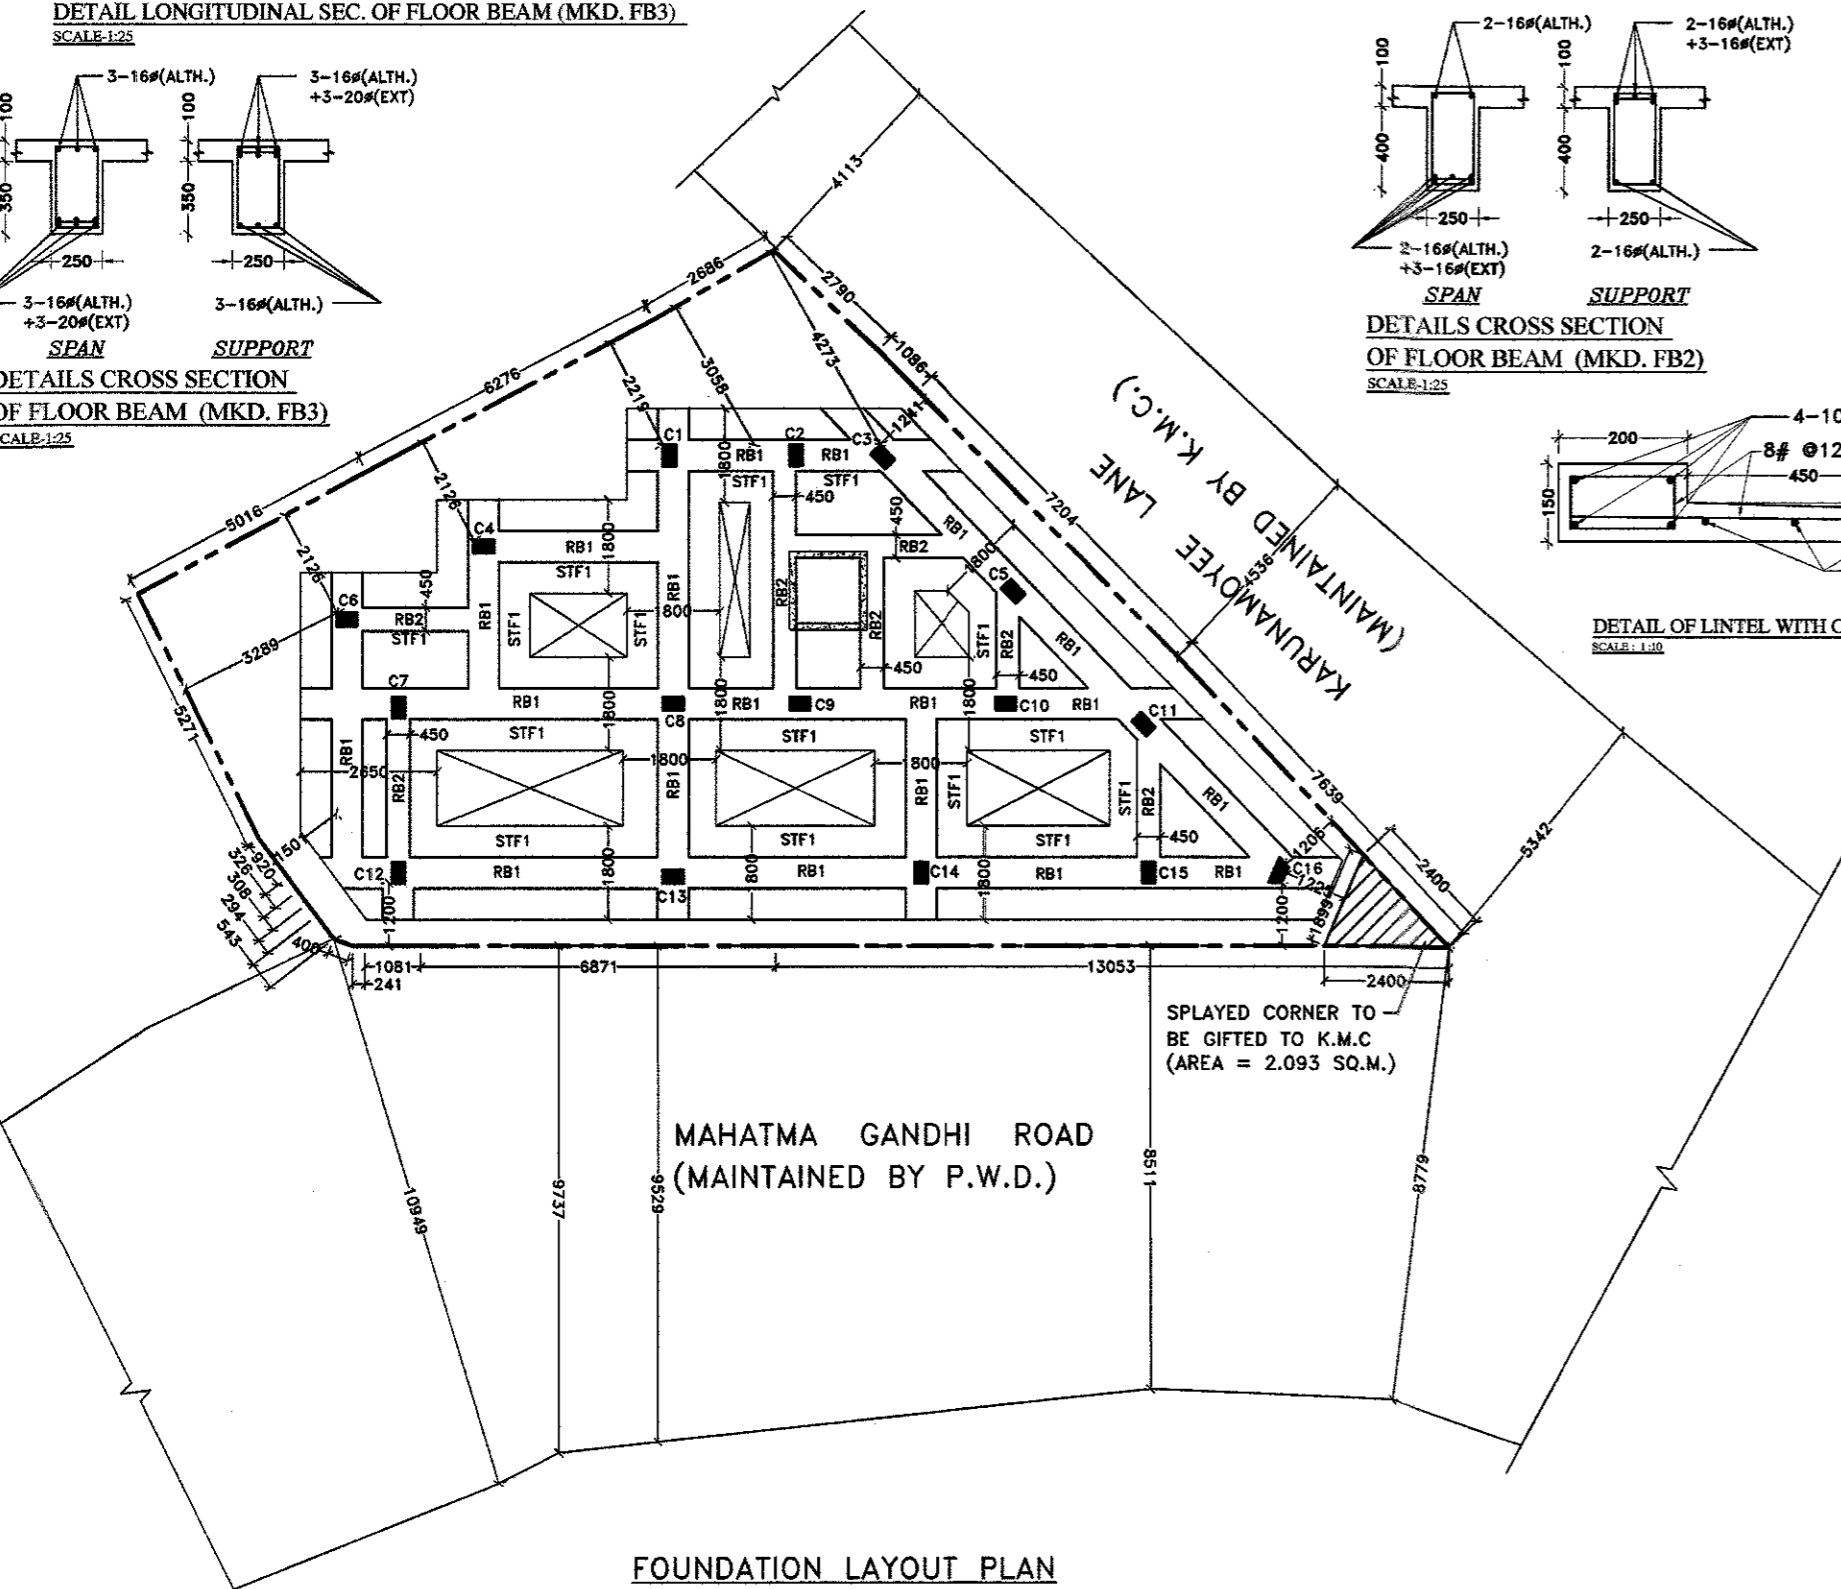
DETAILS CROSS SECTION OF FLOOR BEAM (MKD. FB3)
